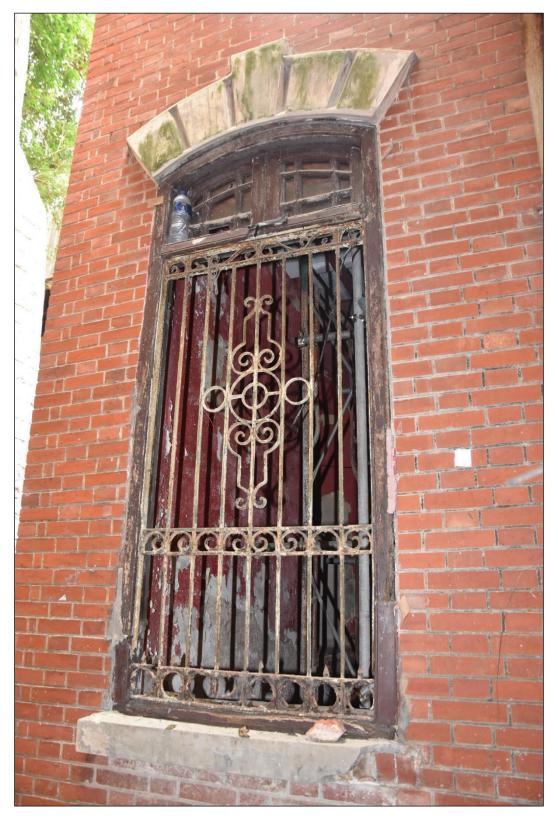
South-east elevation (facing Ship Street), first floor, window Wdw-1f08, external side, (21st March, 2023)
